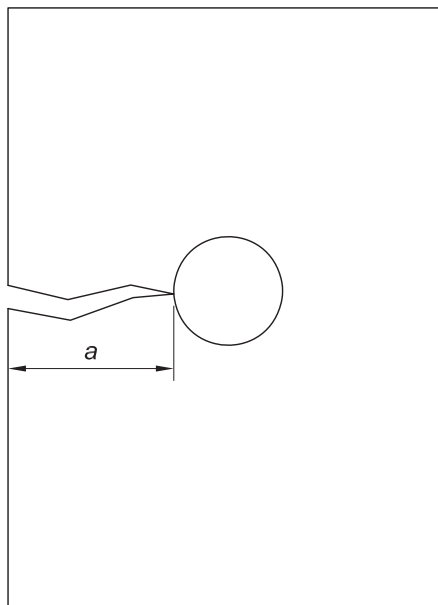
Example of a crack arrest hole where “a” indicates the original crack length.
